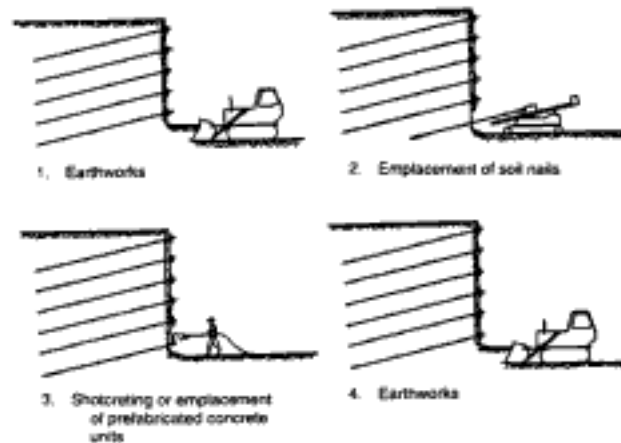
Execution phases of soil nailing (Project Clouterre¹⁰)
